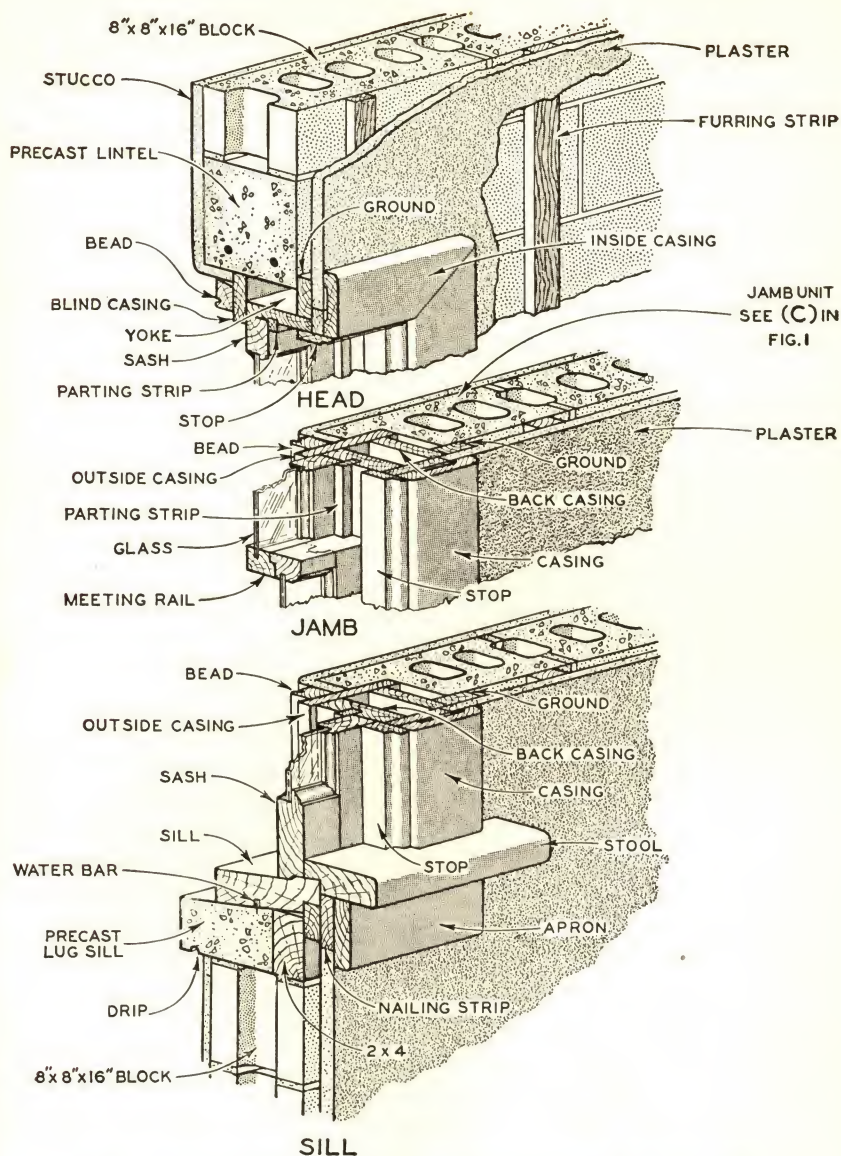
A. Double-Hung Wood Sash Windows in Concrete Masonry Walls
